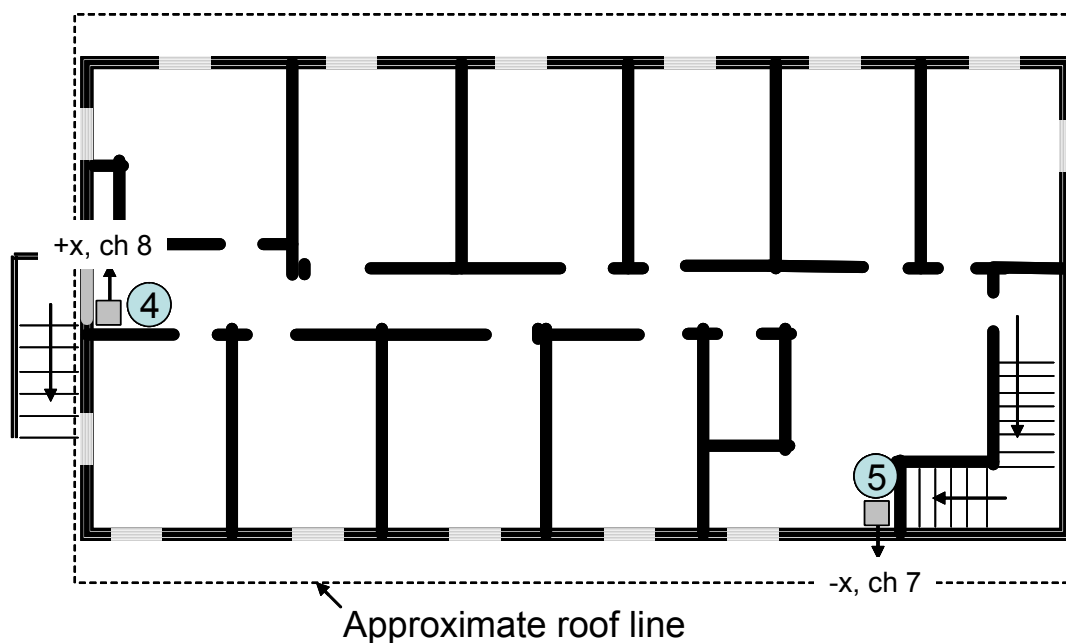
Plan Schematic Showing Numbered Locations and Orientations of Accelerometers for the Ceiling Level Above the Second Floor
